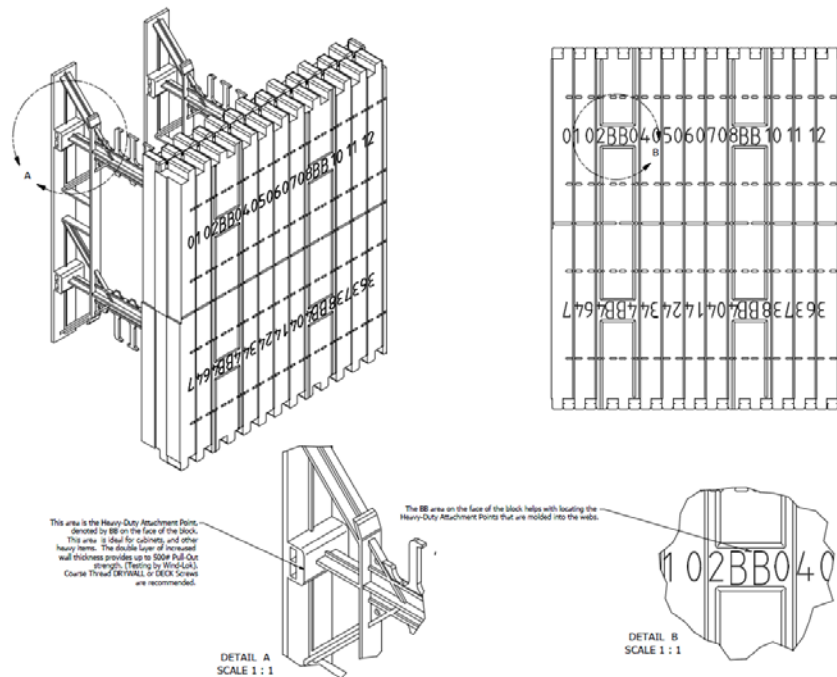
BUILDBLOCK® AND BUILDLOCK® SINGLE STORY WALL DETAIL (TYPICAL)
